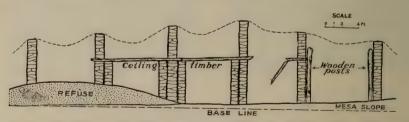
Slightly generalized Cross-section about Midway on Building X, San Cristobal, showing the Relation of the Building to a Refuse Heap, also the Height of the Ceiling and how it was Supported by Additional Walls, Posts, etc.
